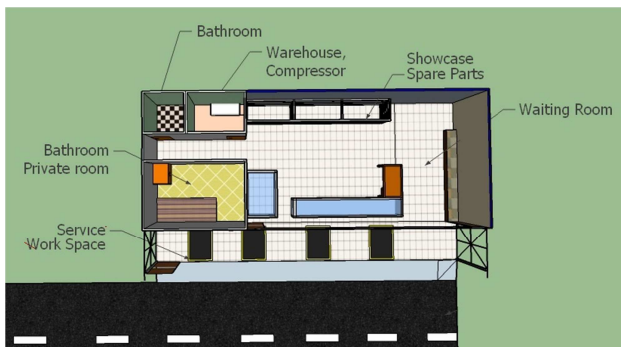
Workshop Design with Horizontal Perspective of Land and Building
